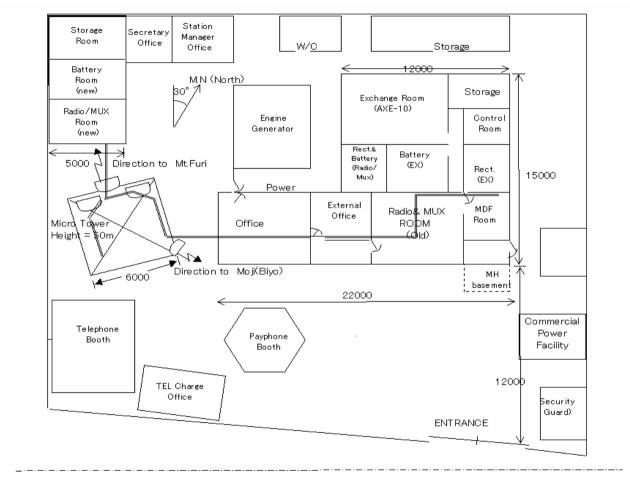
(1/2) Debre Zeit Building Layout
